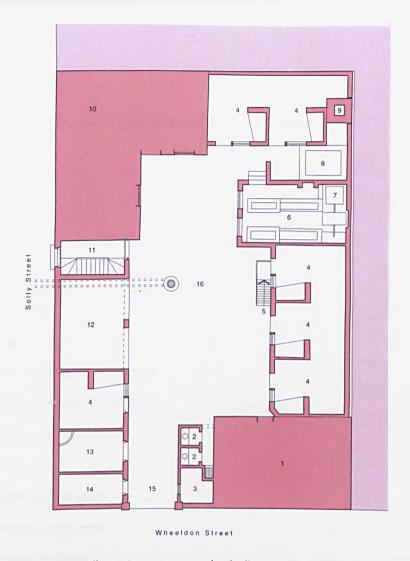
One of the smallest steam-powered grinding wheels proposed (just two troughs), from a plan for the Wheeldon Street works of Wilson & Southern. Scale 1:200 (author).
